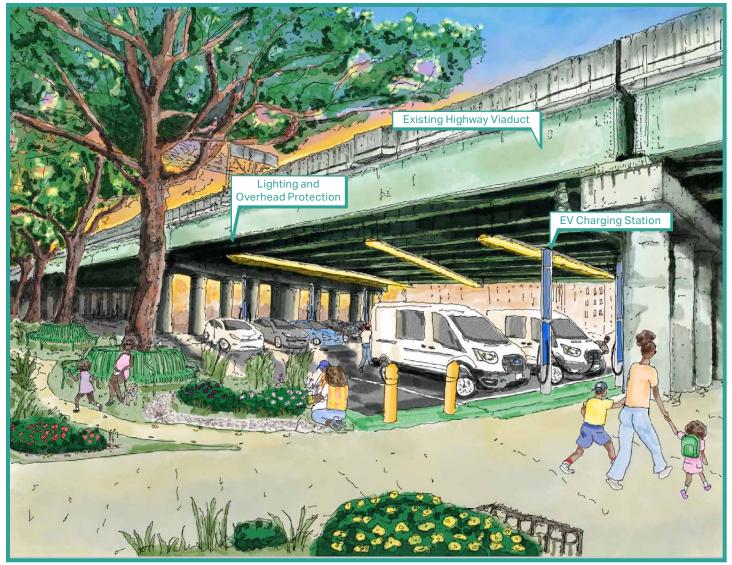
Existing Conditions Illustration for activation under the elevated between Webster Avenue and 3rd Avenue
